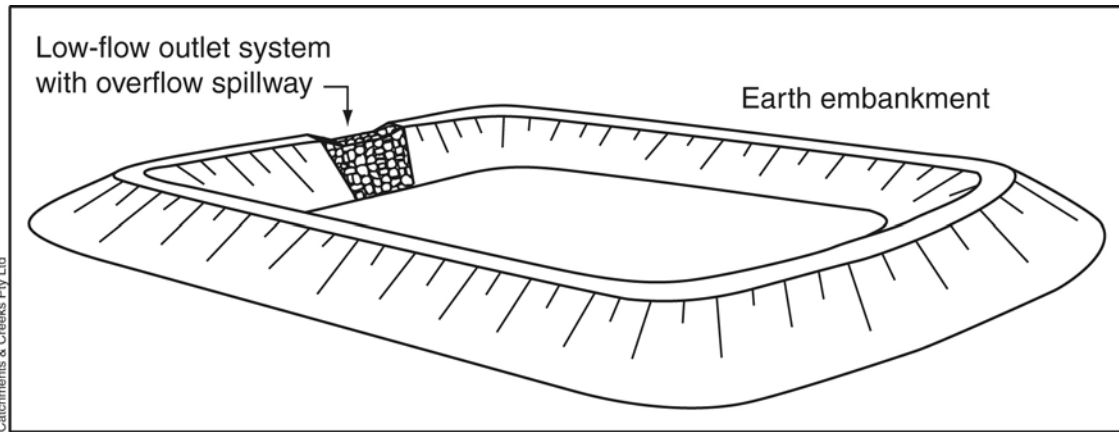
Settling pond with *Rock Filter Dam* outlet structure
